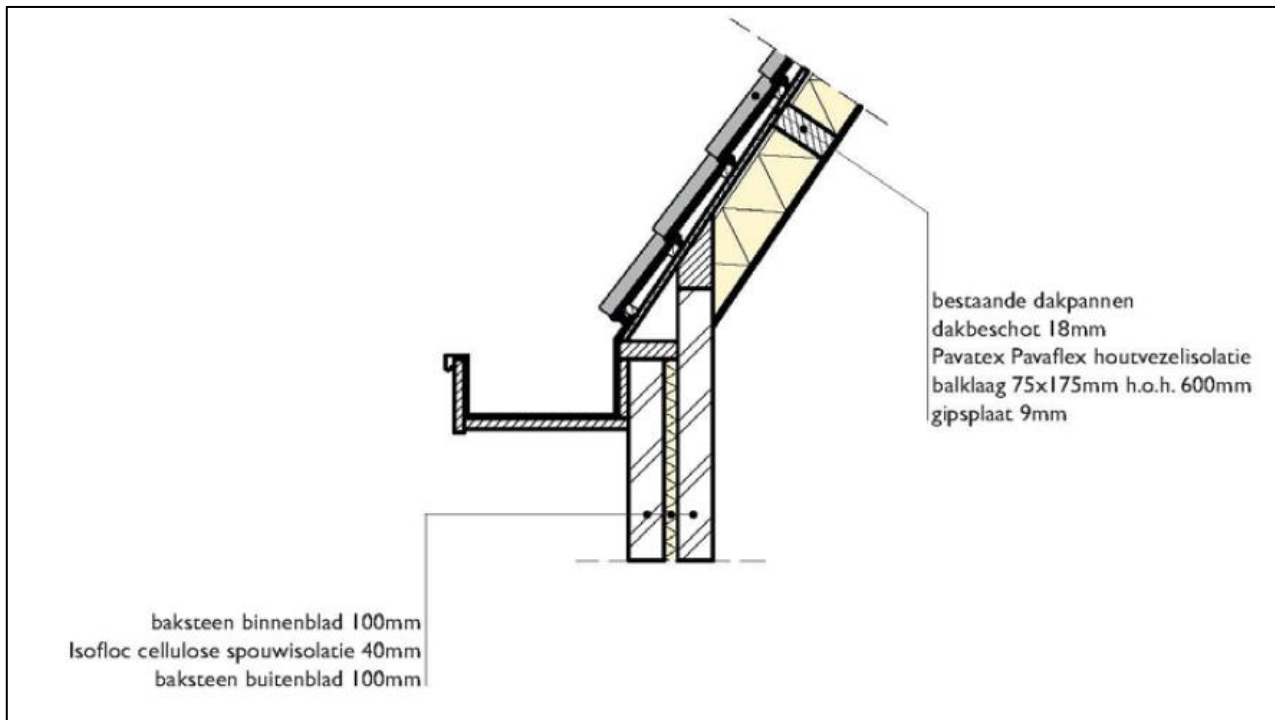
Brick Solution Cavity Wall Cross Section Detail (Haagen, 2015)
